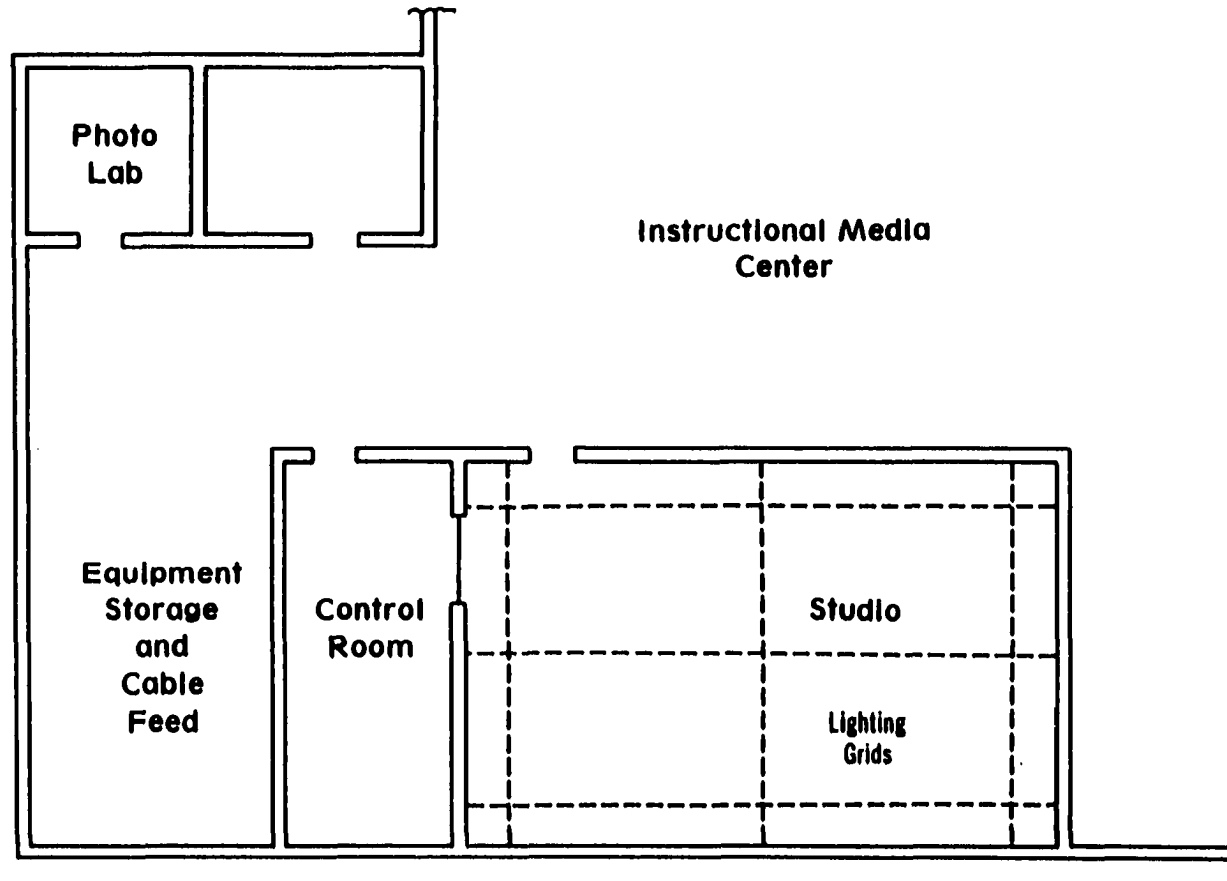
Floor Plan of Grand Rapids Public School's Television Complex housed as part of the instructional media center in the junior college.
